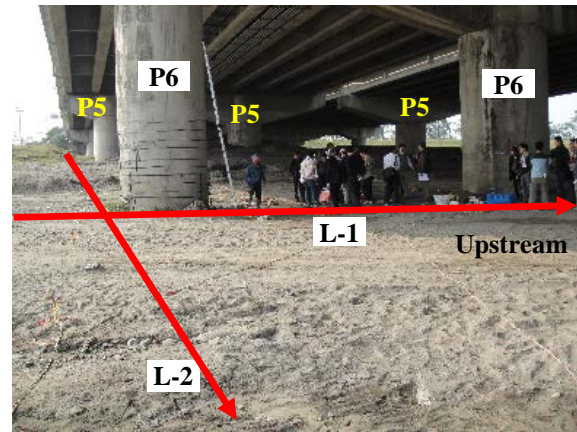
ERT inspecting the pile foundations of the Wanda Bridge.
